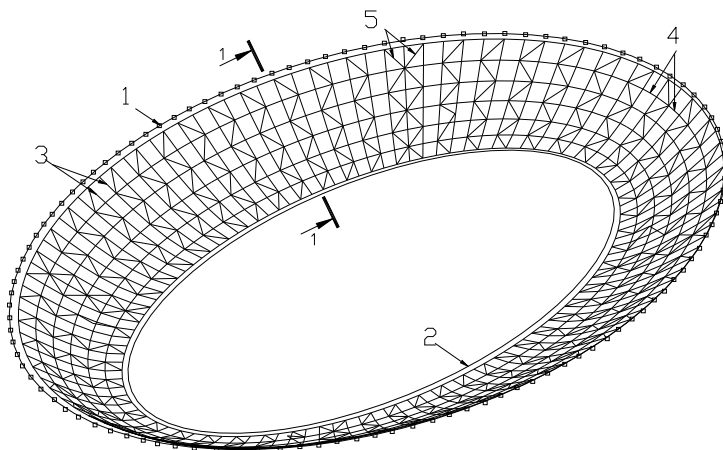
Structural schematic drawing of spatial and rod suspension roof:
